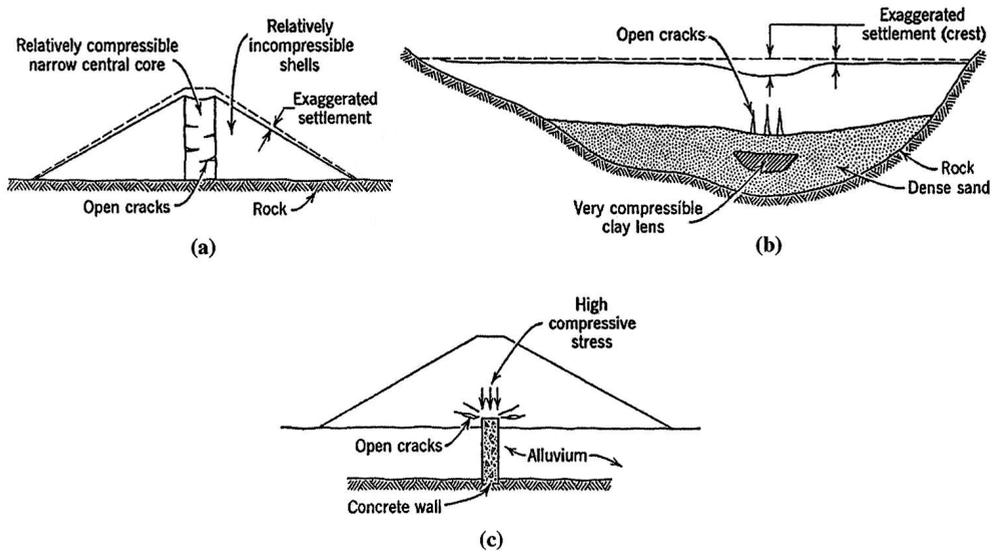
Typical internal differential settlement cracks in embankments (Sherard *et al.*, 1963).
